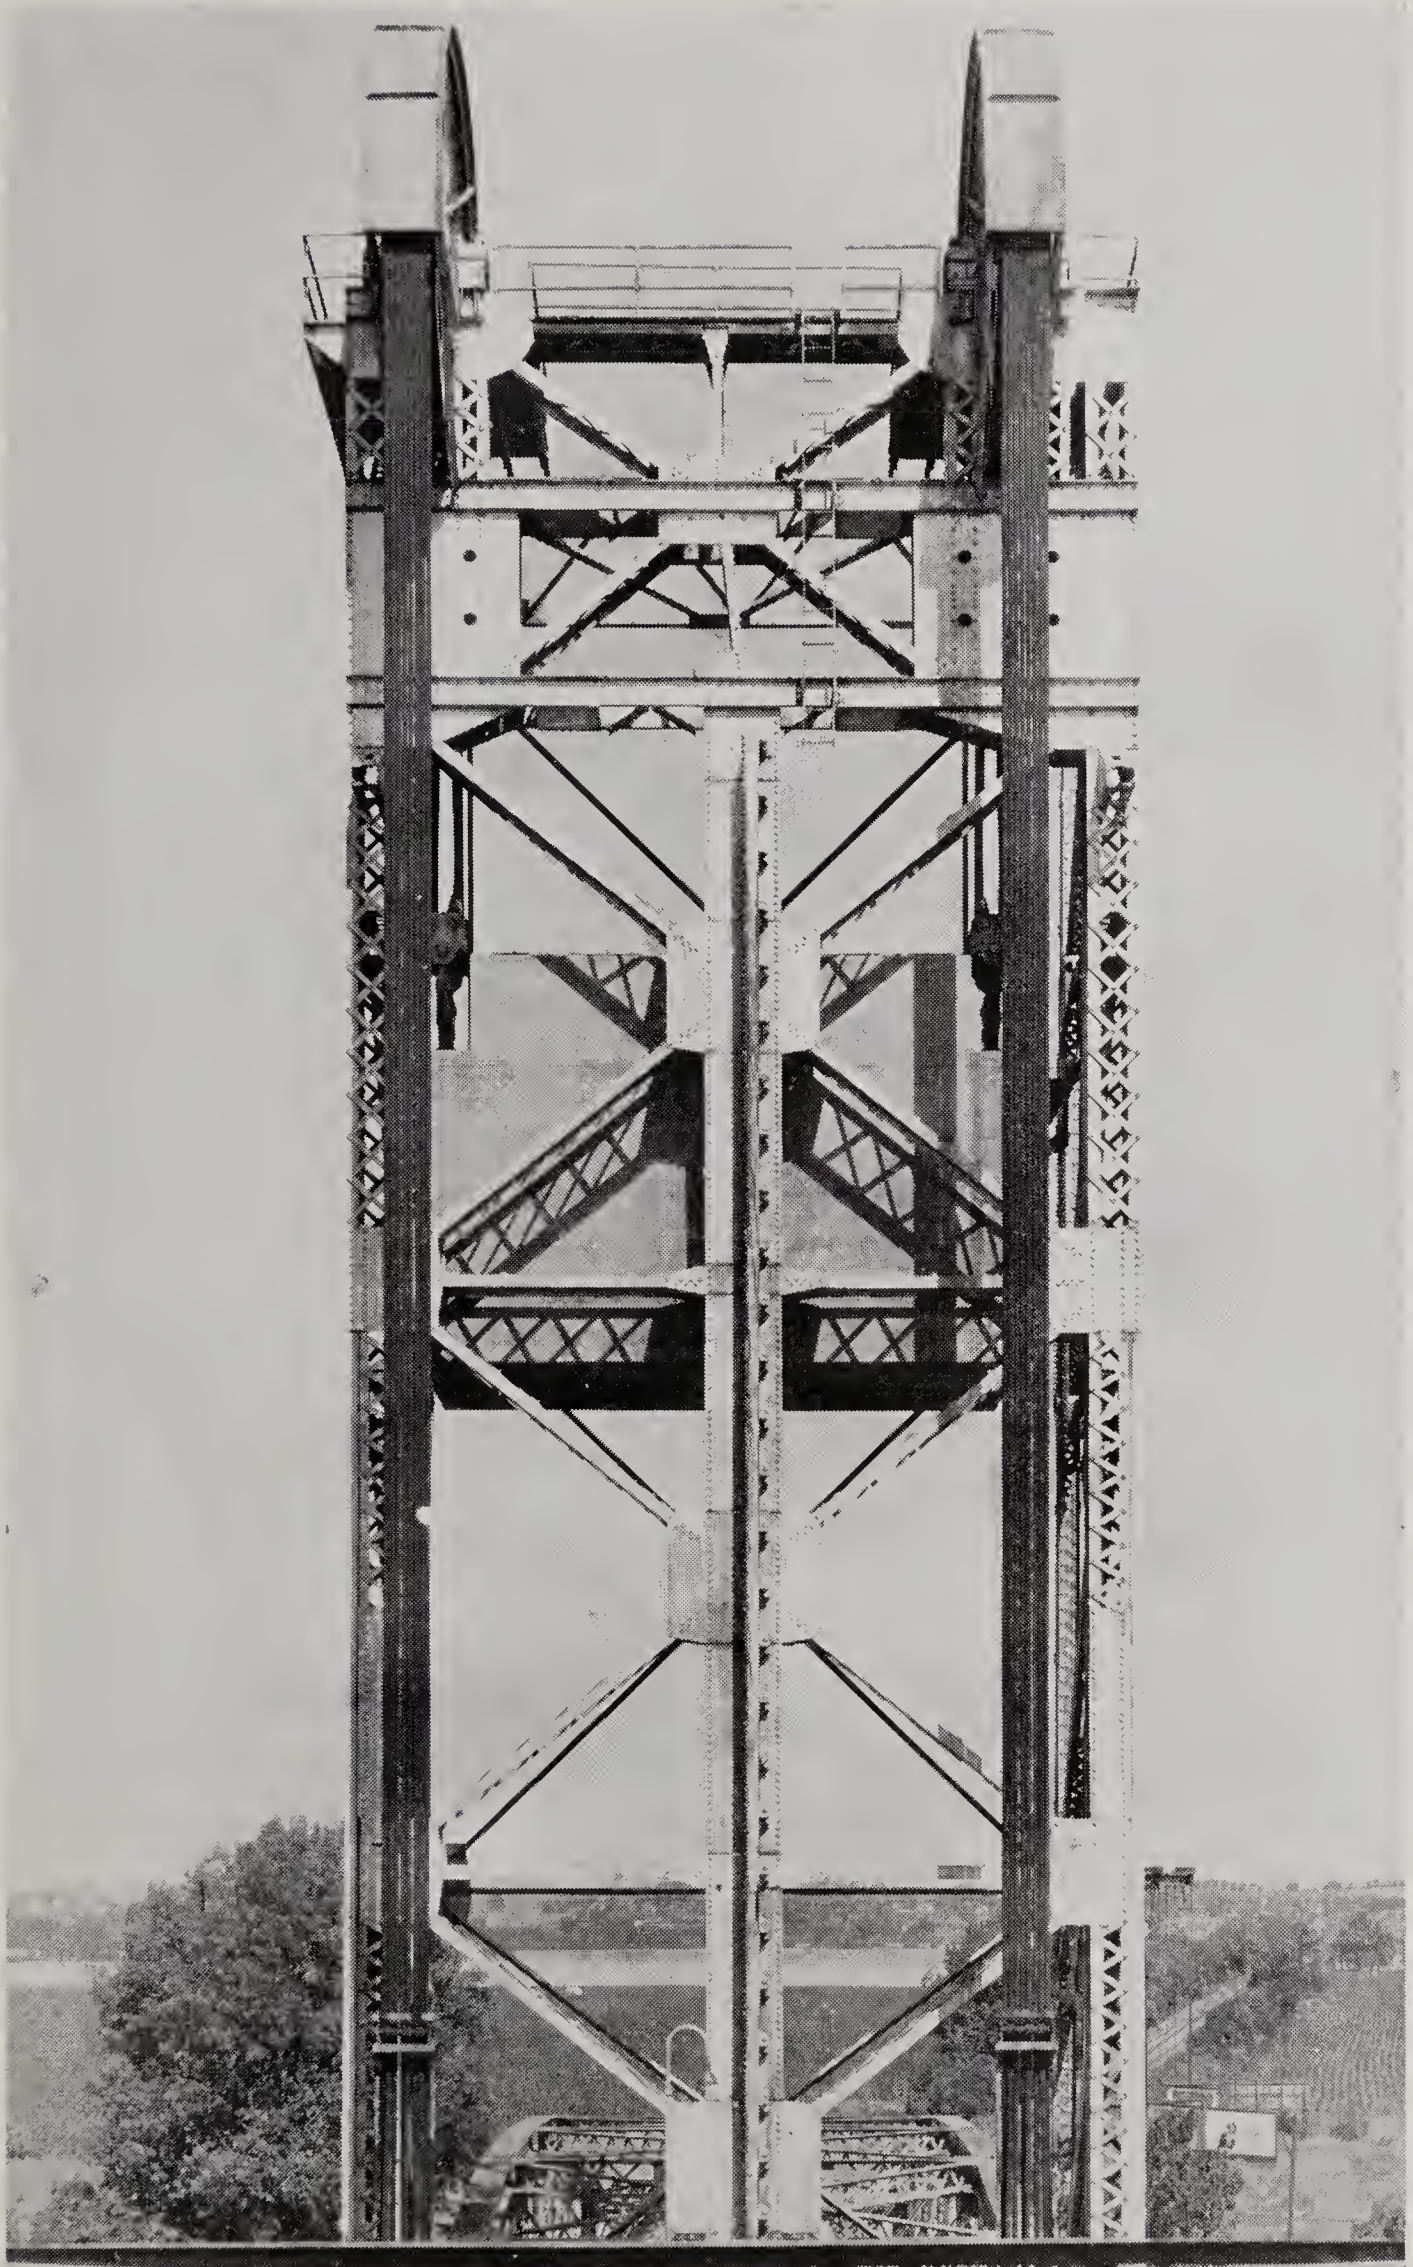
Pekin Bridge. West Tower, showing counterweight cables.
